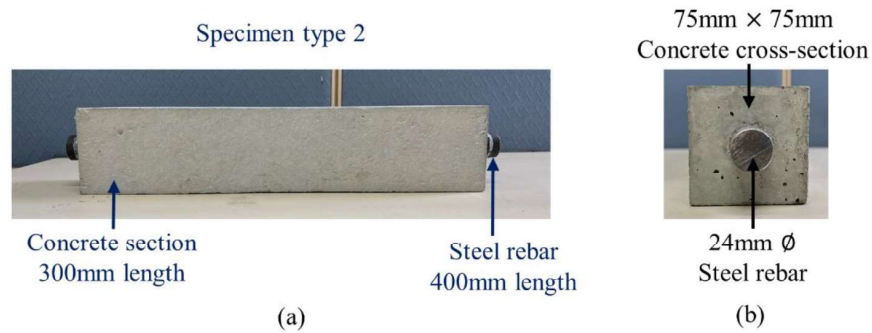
(a) Longitudinal and (b) cross-section view for specimen type 2 with exposed rebar ends
